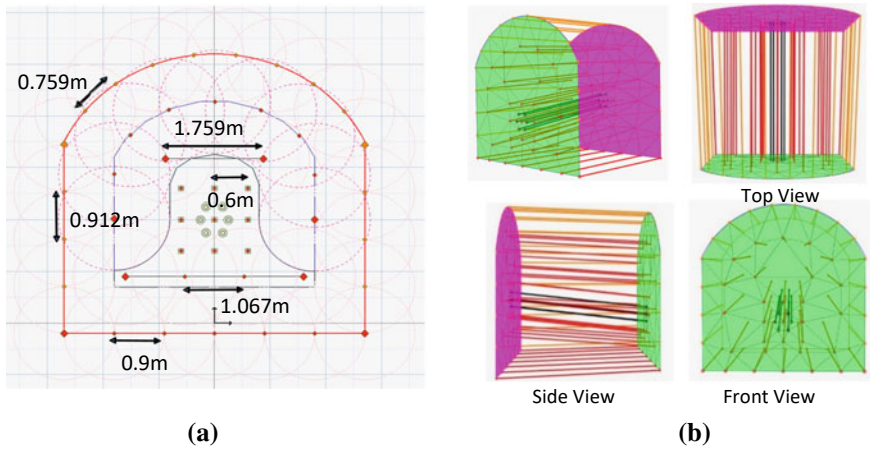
(a) ESD 001 second trial (revised drill pattern, 51 mm bit, chainage 42.8 m) (b) Three-dimensional modelling (top, side and front views), 42.8 m
